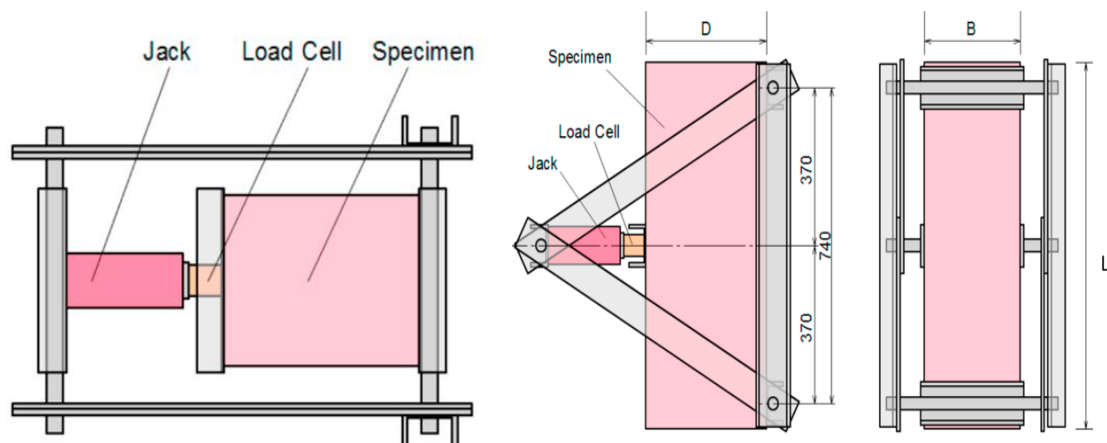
Loading arrangement of three-point bending test on masonry prisms
